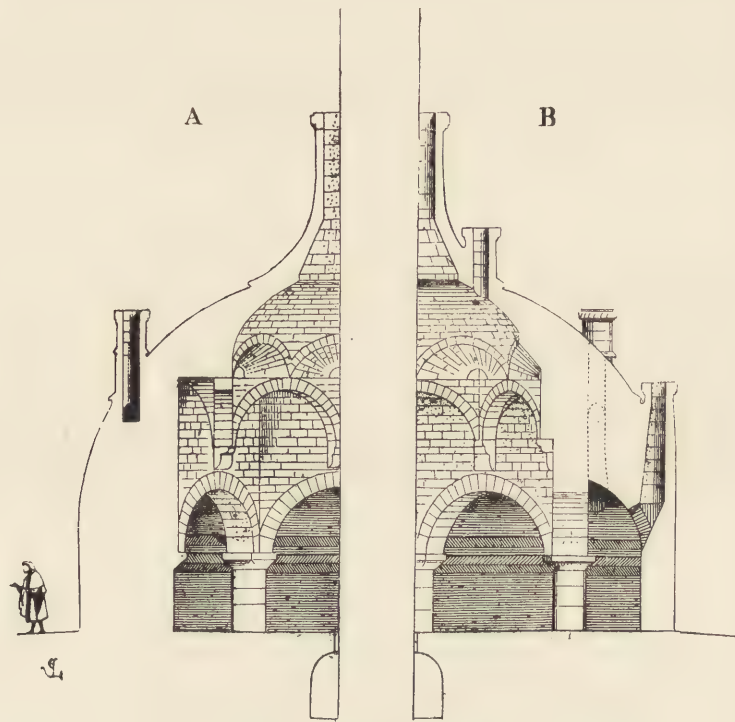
A, HALF-SECTION ON THE LINE L K (SEE PLAN). B, HALF-SECTION ON THE LINE K N (SEE PLAN).
